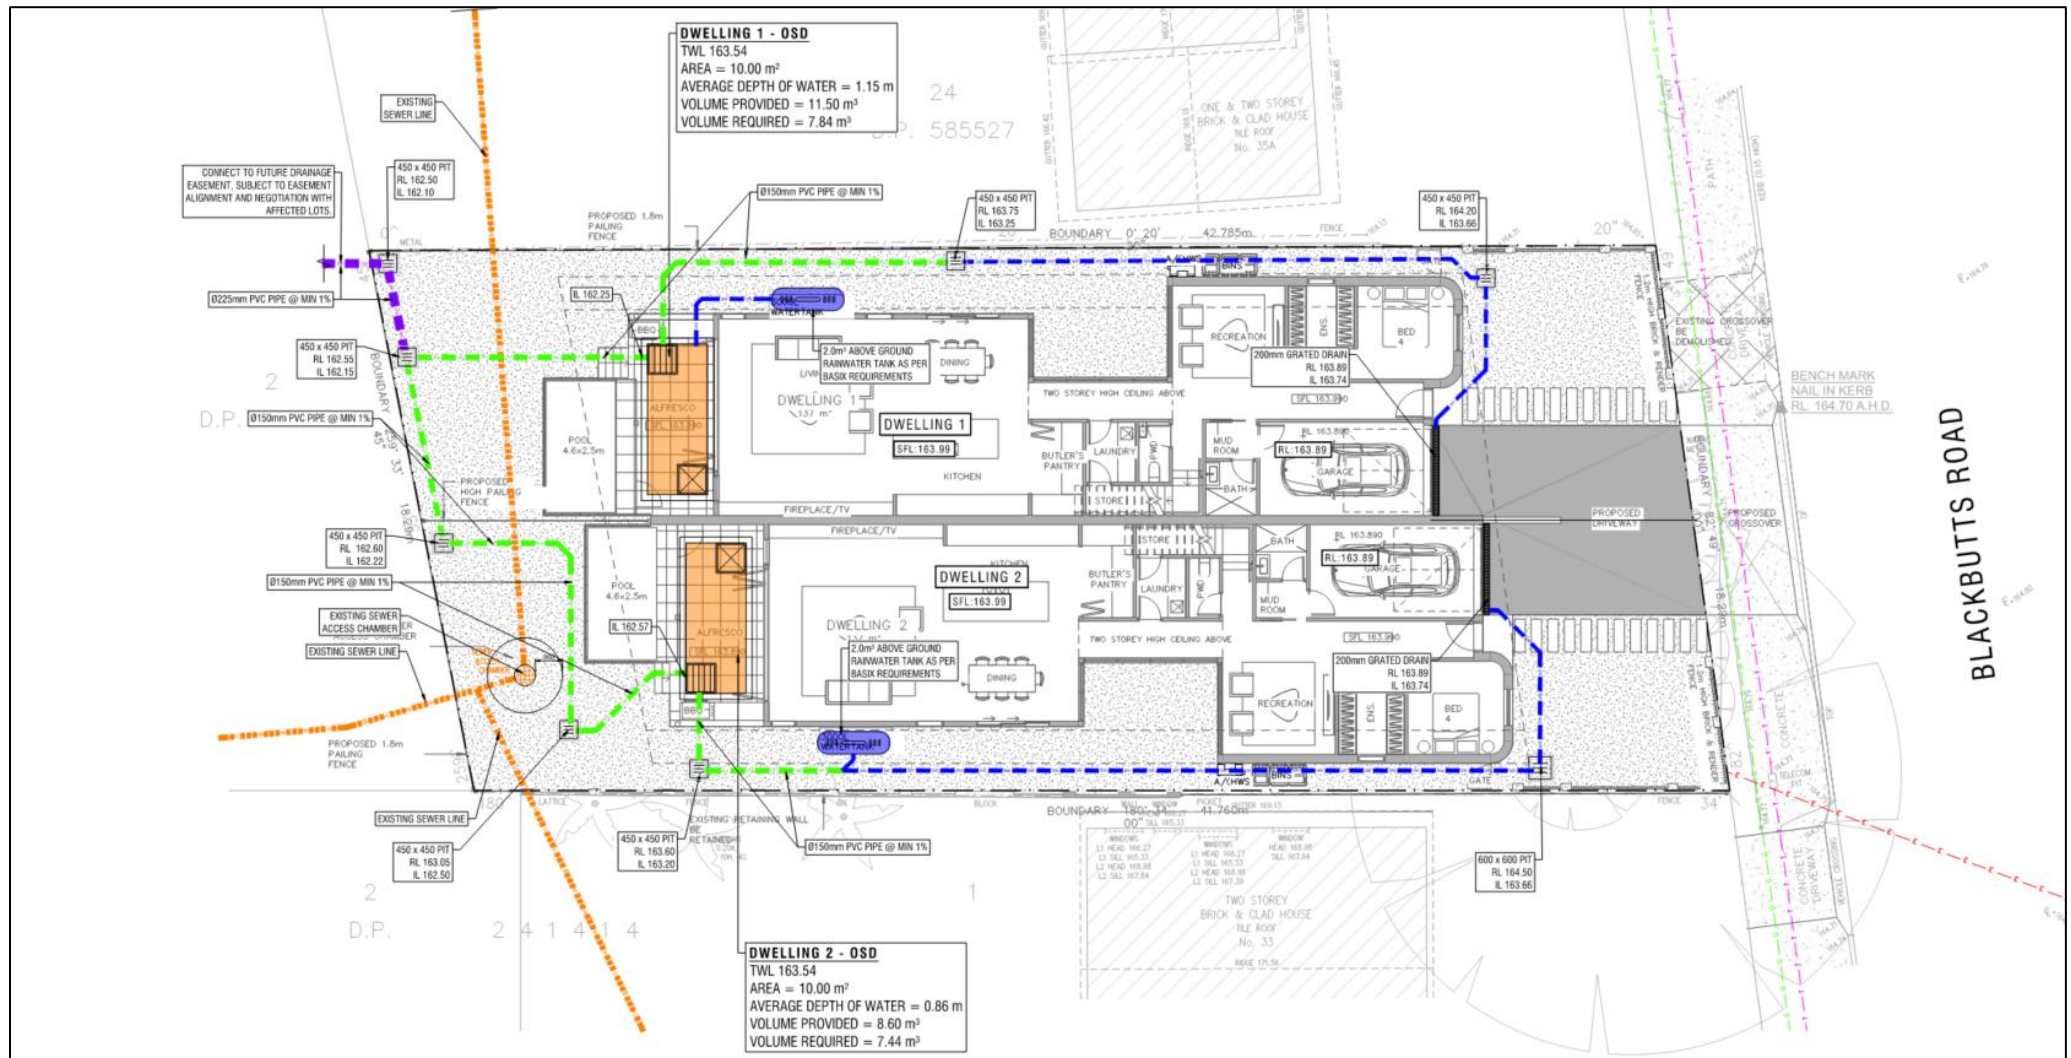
Stormwater Plan, prepared by *Smart Structures Australia* (Project No: 25021, Sheet No: D01, Revision: B, drawn: 10/06/2025).
